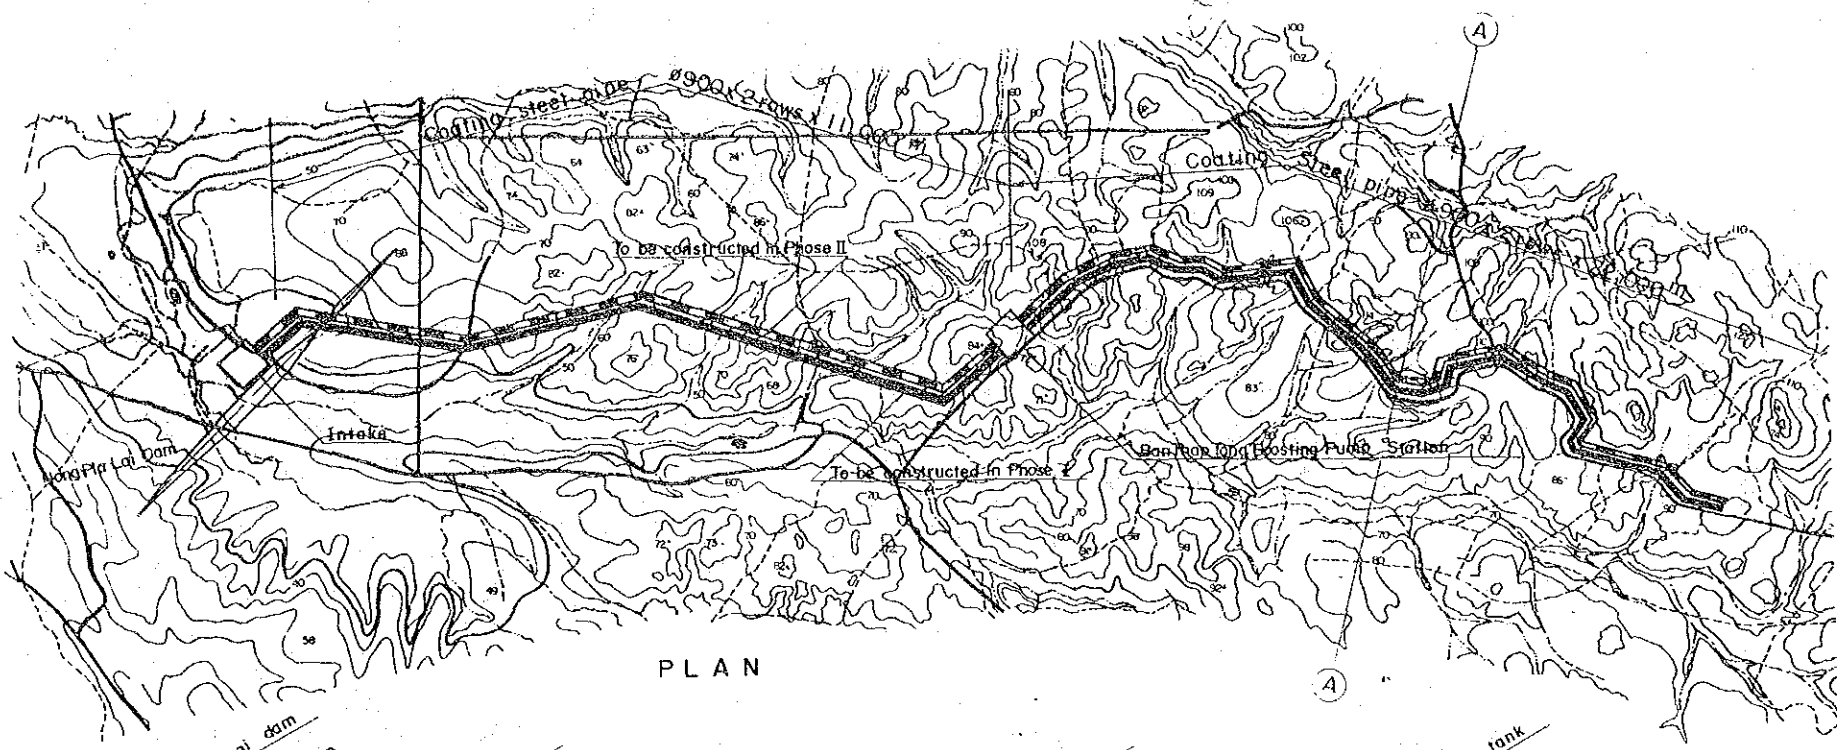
Nong Pla Lai System, Plan and Profile of Pipeline (1/2)
